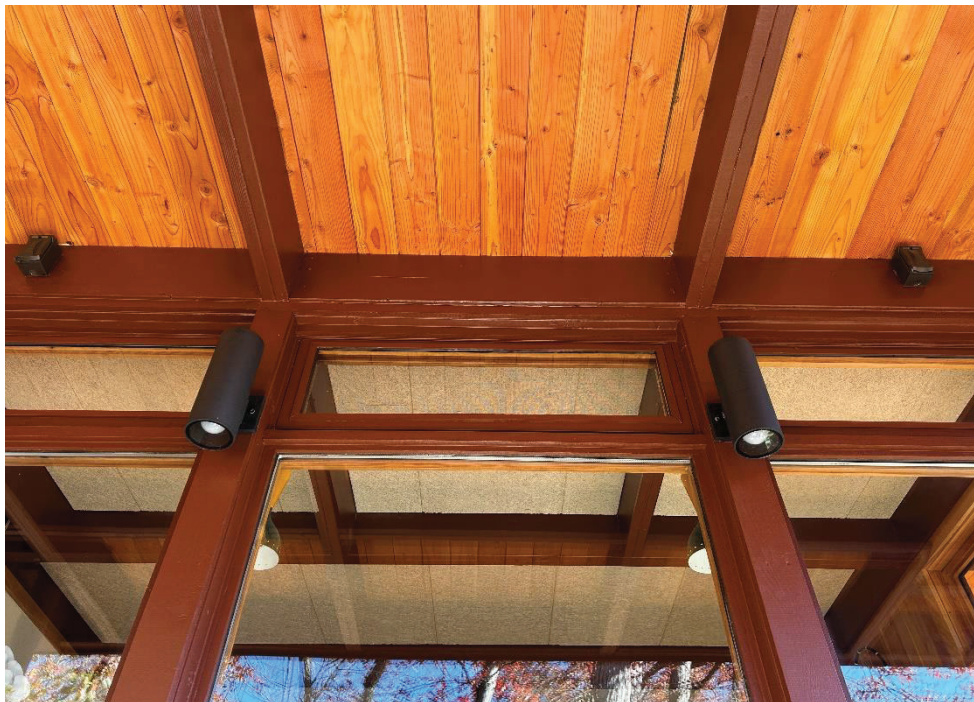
Depicts the flowing lines and grid geometry of the exterior deck overhang and the interior living room ceiling, separated by the large living room windows. Camera facing east.
